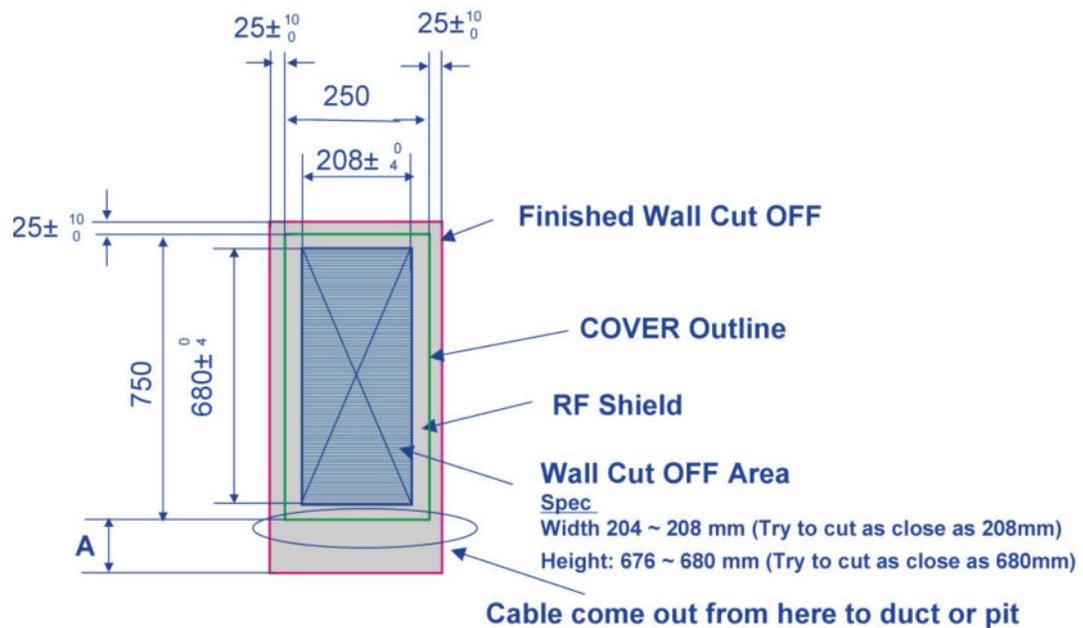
Wall for System Cabinet Detail (Equipment (or Operator) Room Side)
